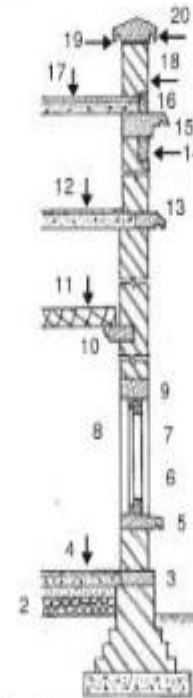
Section through a wall: 1. Foundation, 2. Hard core (Basement filling), 3. Plinth, 4. Ground floor, 5. Sill, 6. Window, 7. Reveal (revealed vertical wall on the sides of door or window frame as inner reveal and outer reveal), 8. Jamb (vertical wall on both sides of doorway or window opening), 9. Lintel, 10. Corbel, 11. Ceiling, 12. Upper floor, 13. String course with throating, 14. Frieze (stone course below cornice), 15. Cornice, 16. Blocking course, 17. Terracing, 18. Parapet, 19. DPC under coping, 20. Coping.
